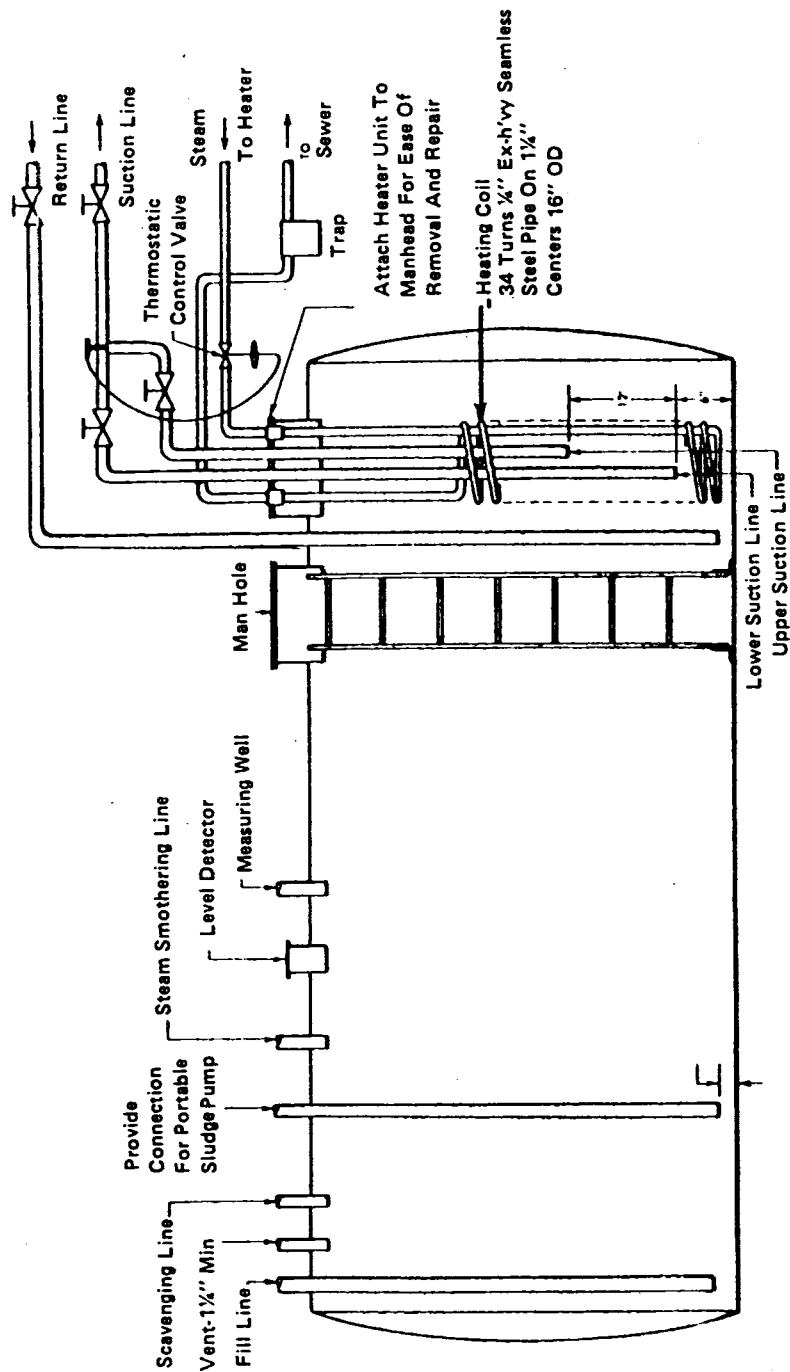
UNDERGROUND FUEL OIL STORAGE TANK
